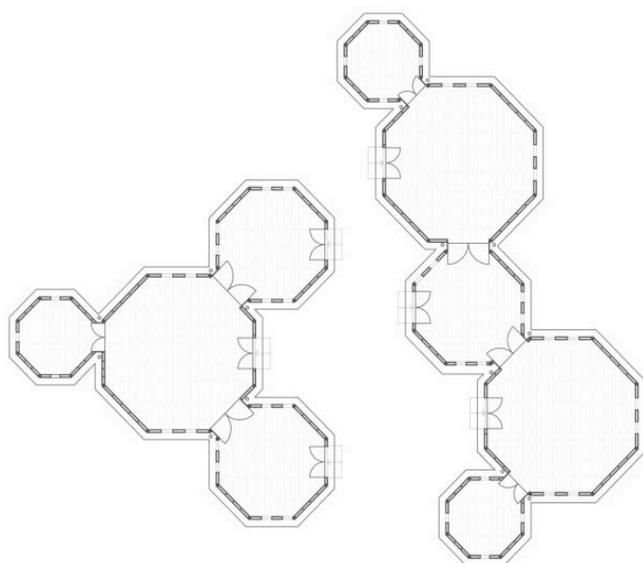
Ground floor plan: intersection of hexagonal shapes
